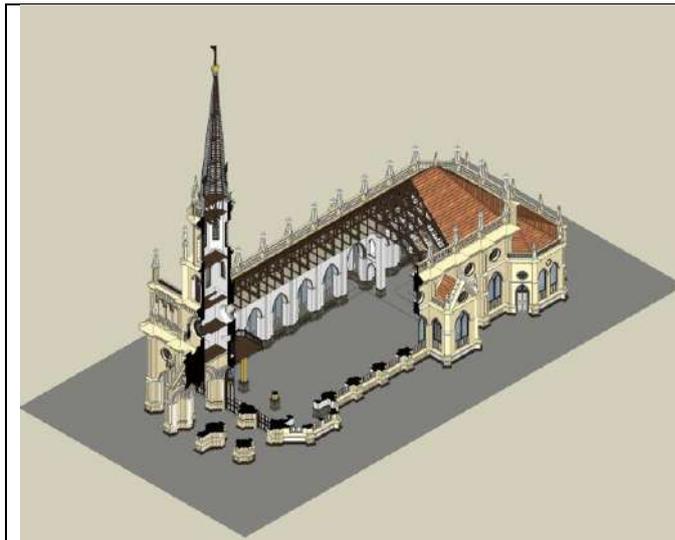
Isometric drawing of the Holy Rosary Church showing roof and spire structure.
